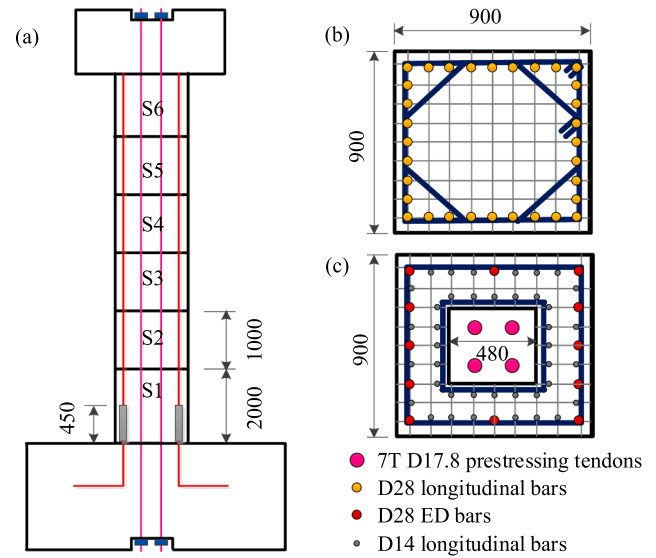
Details of the designed segmental UHPC column (a) elevation of the segmental column; (b) cross-section of the monolithic column; (c) cross-section of the segmental column (mm).
